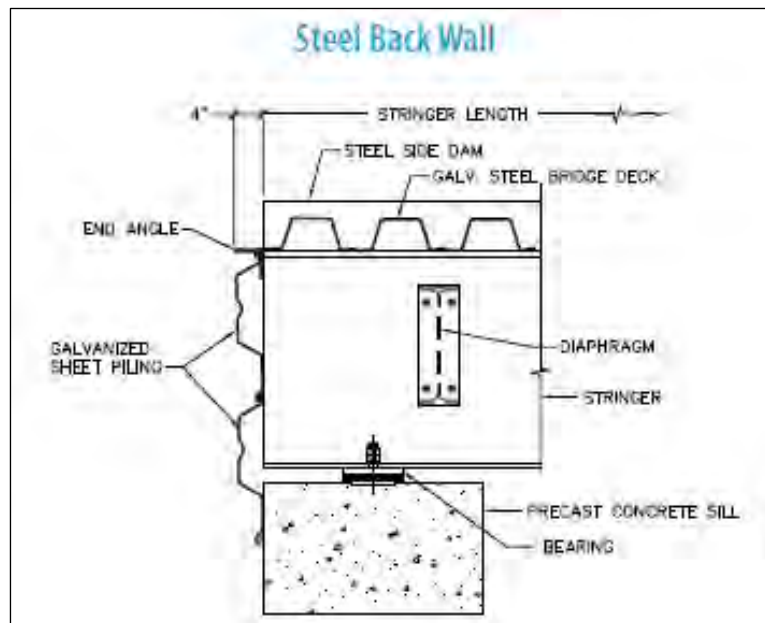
Close-up of prefabricated modular steel vehicle bridge showing back wall support (Courtesy of Big R Bridge)
